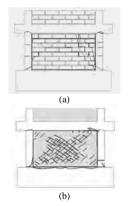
Damage pattern of (a) unretrofitted specimen and (b) retrofitted specimen
